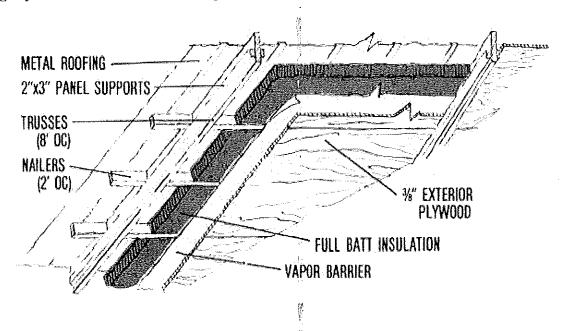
Set-in-place insulated roof panels (R=13-15). Set-in-place insulated roof panels are fabricated on the ground and placed between trusses. The panel studs act as blocking to provide lateral roof strength. Roofing is applied after panels are nailed securely in place This system works well in modified open-front livestock housing and farm shops.
